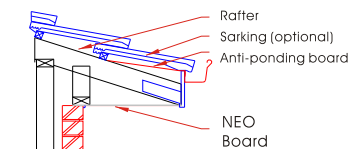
Simple Spanning Eaves - Brick Veneer Wall
